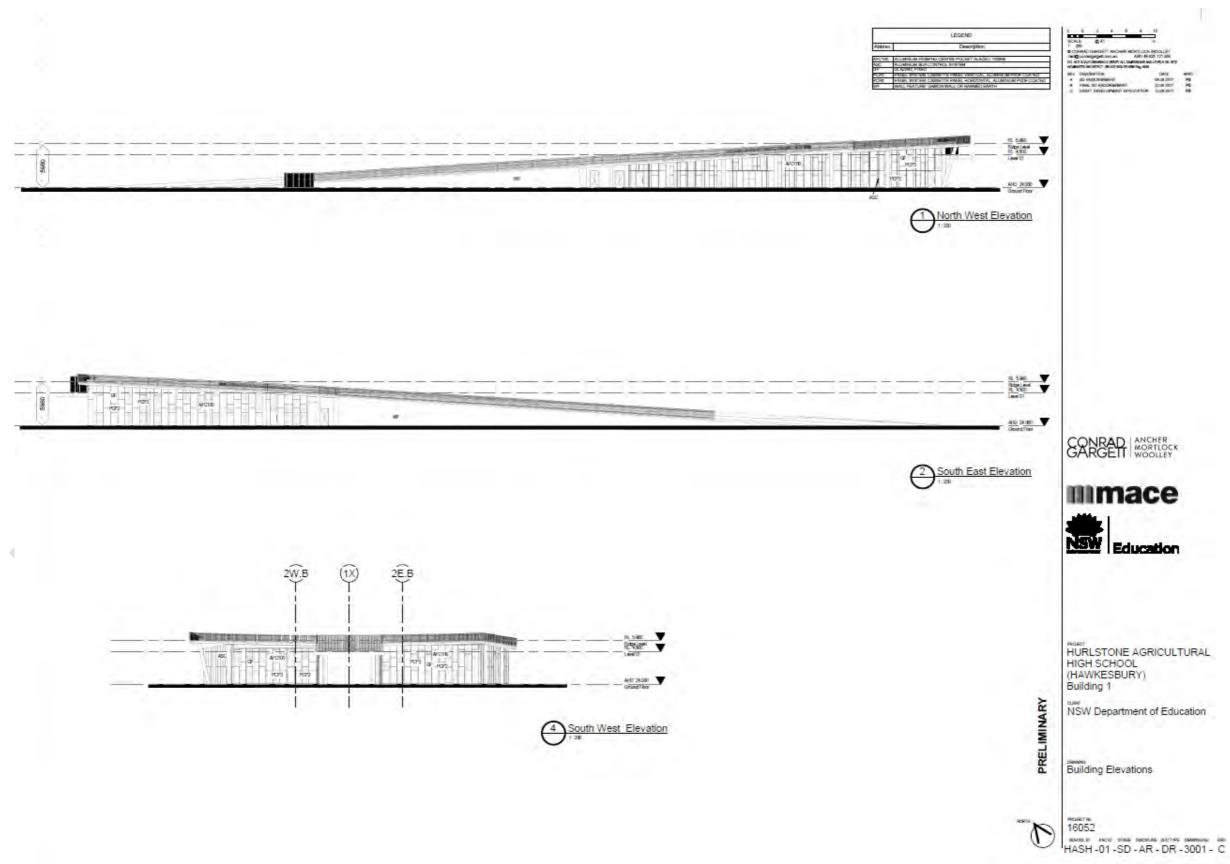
Proposed Sections Building 1 Can'ad Gargett Ancher Mortlock Woolley (2017) HASH01-SD-AR-DR-3001-C
